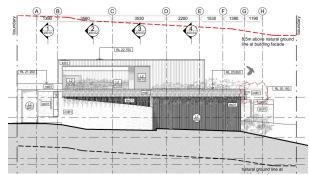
Extract of the proposed western elevation. Lift addition clouded in red.
